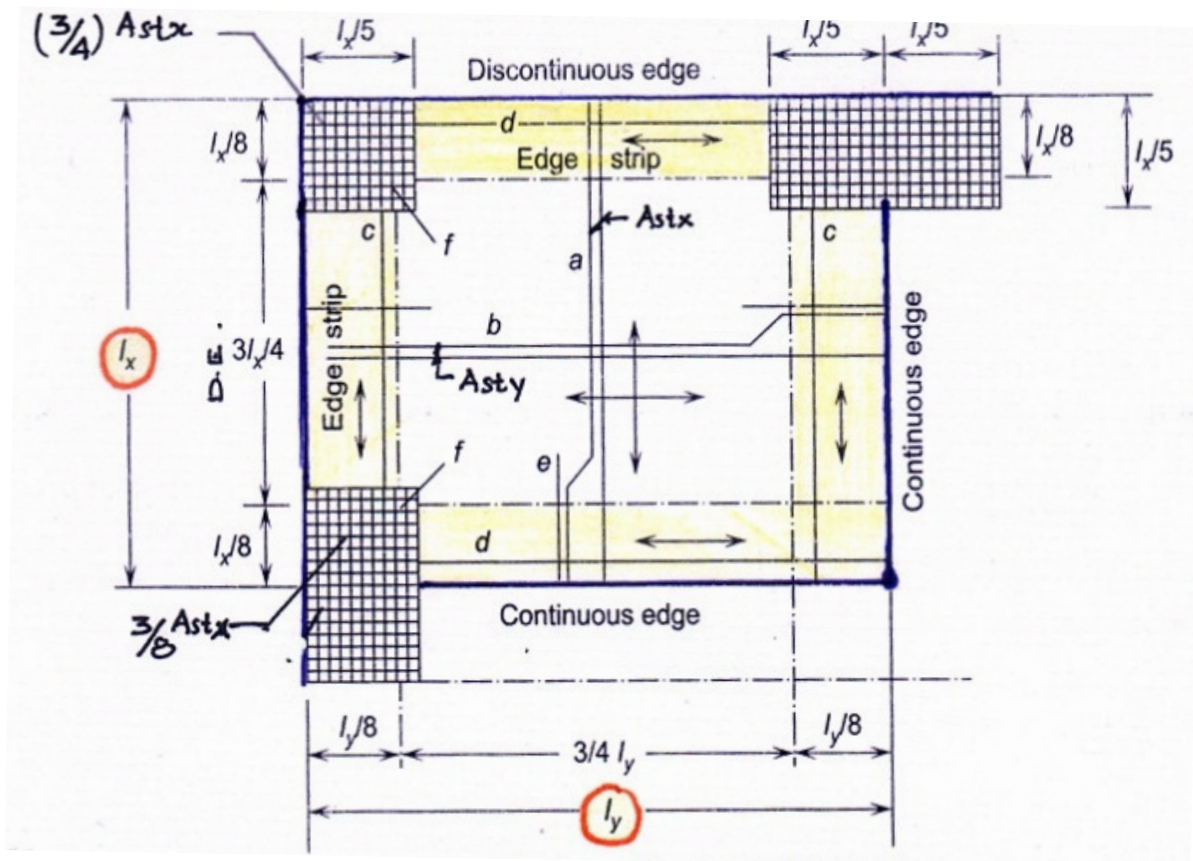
Reinforcement details and strips in Two way restrained slabs
